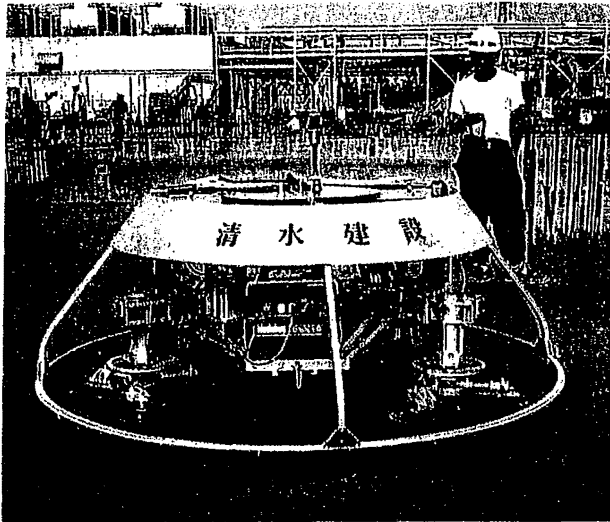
Plastering robot (Concrete Floor finishing robot).
